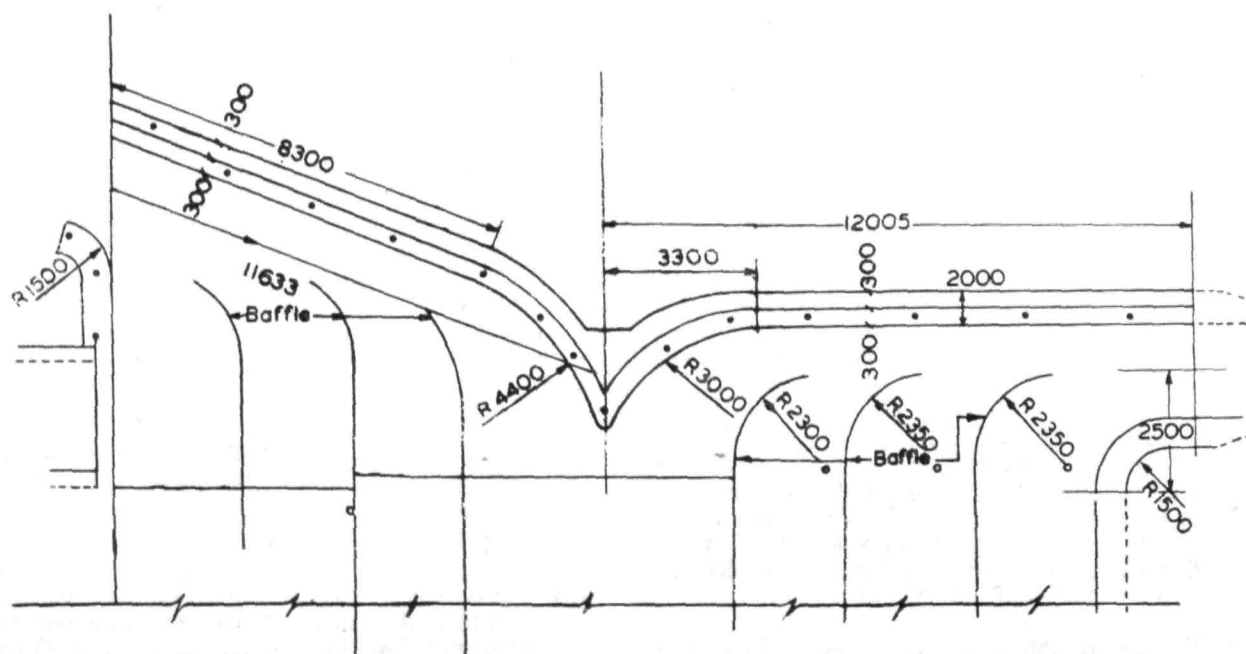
Layout of sump-pump house for extension Units I & II—Guru Nanak Thermal Plant, Bhatinda (T.C. Engrs).
